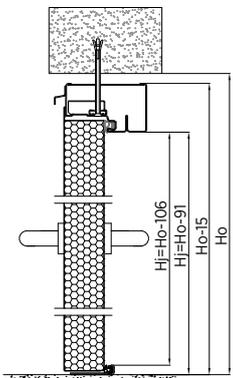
Installation of the double-leaf door to a masonry wall - internal frame with a thermal break - vertical cross-section
